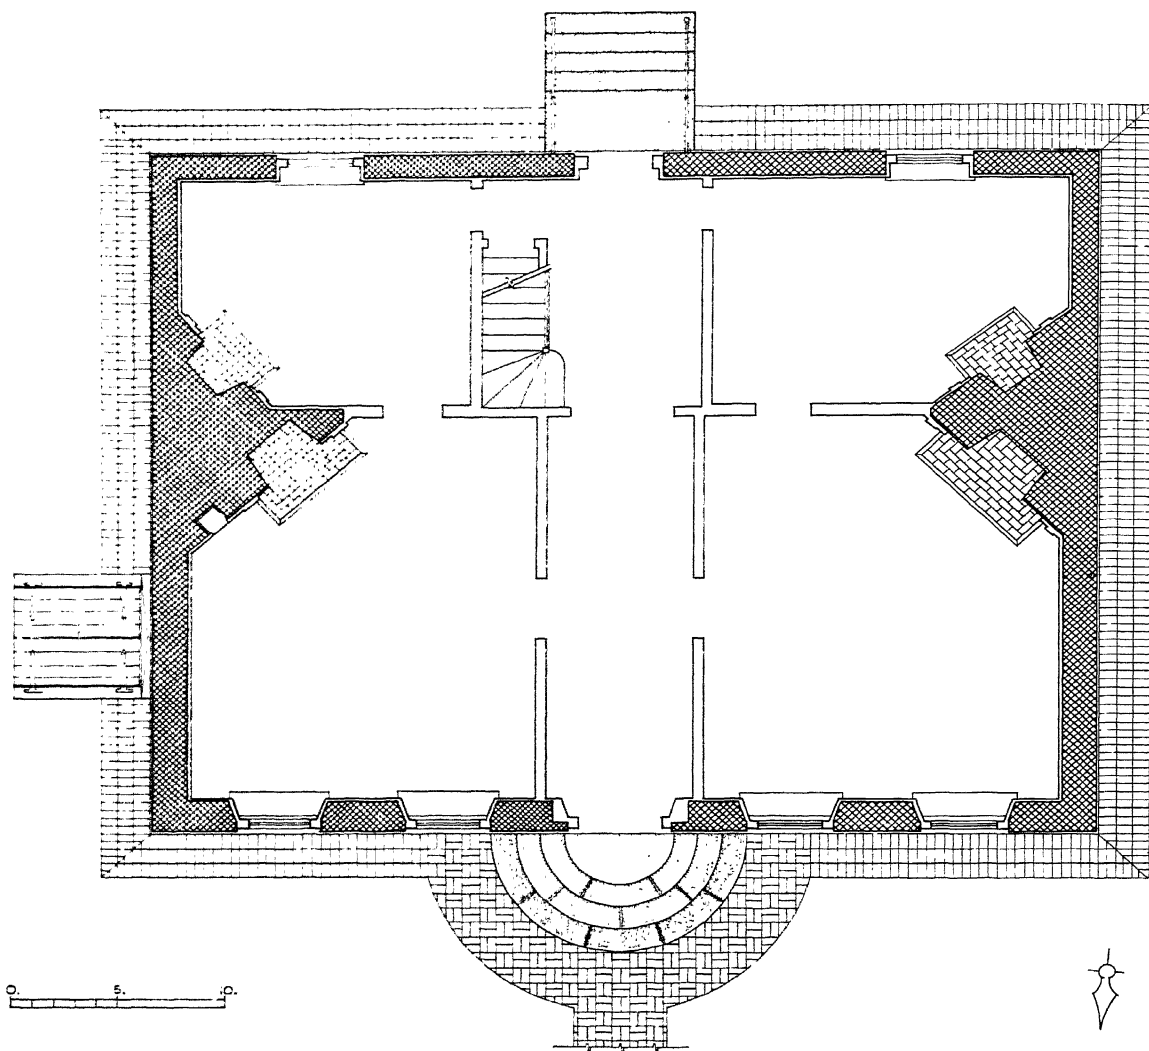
THE ALLEN-BYRD HOUSE. Plan.
